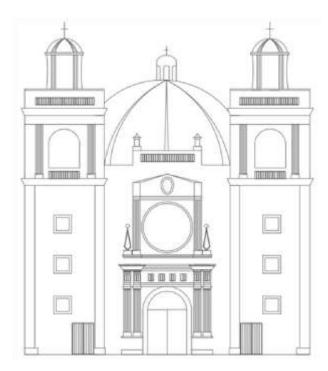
, 5 Architectural plan and overall plan of the nave of the Basilica
